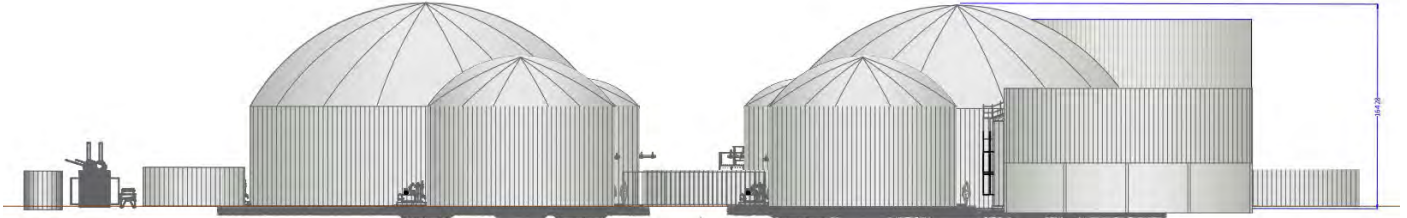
Elevation illustrating proposed works. Source: AMZCO Power.
